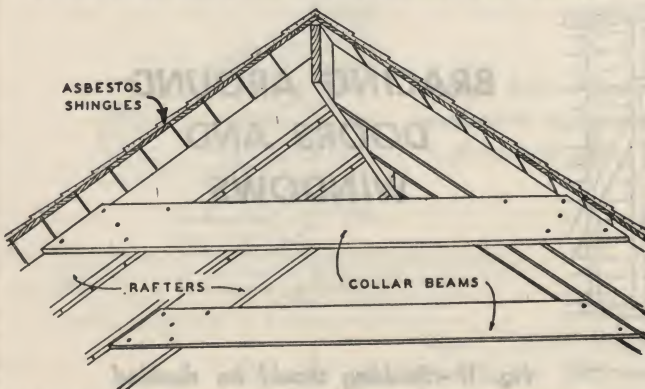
Brace roofs with collar beams, suspend hay track from collar beams, not from ridge pole.
